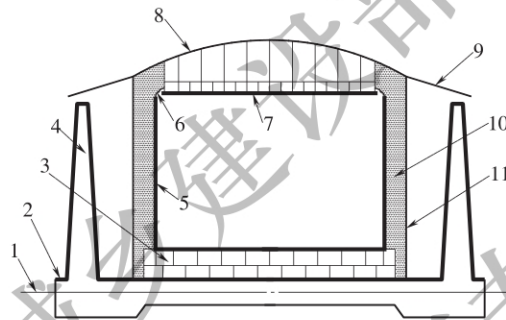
Double containment tank with secondary pre-stressed concrete container
